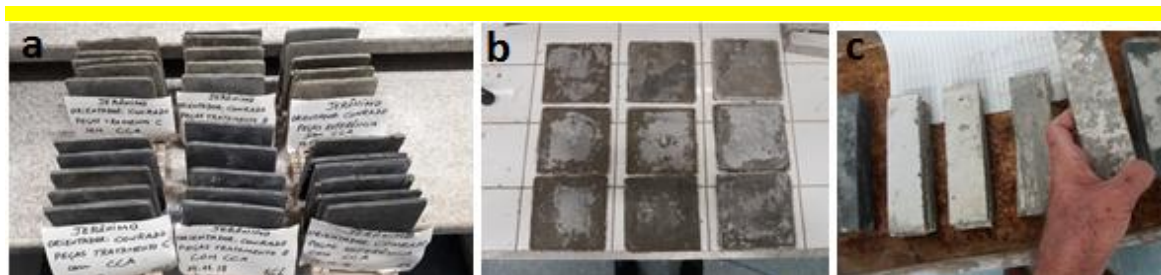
Molded fiber Cement Samples. (a) Fiber Cement Plate, (b) Top View of the Plates, (c) Test Specimens after Cutting the Plates
